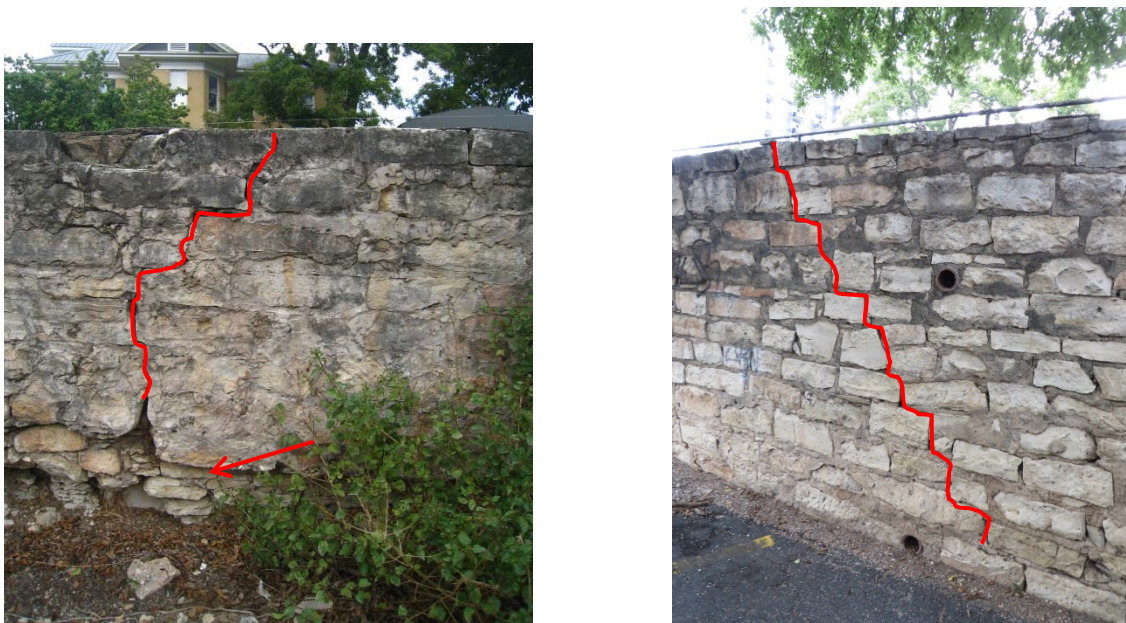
Wall on the south side of main drive; Left, cracking on outside face of wall and outward displacement at the base (highlighted). Right, stair step cracking on the outside face of the wall (highlighted).
